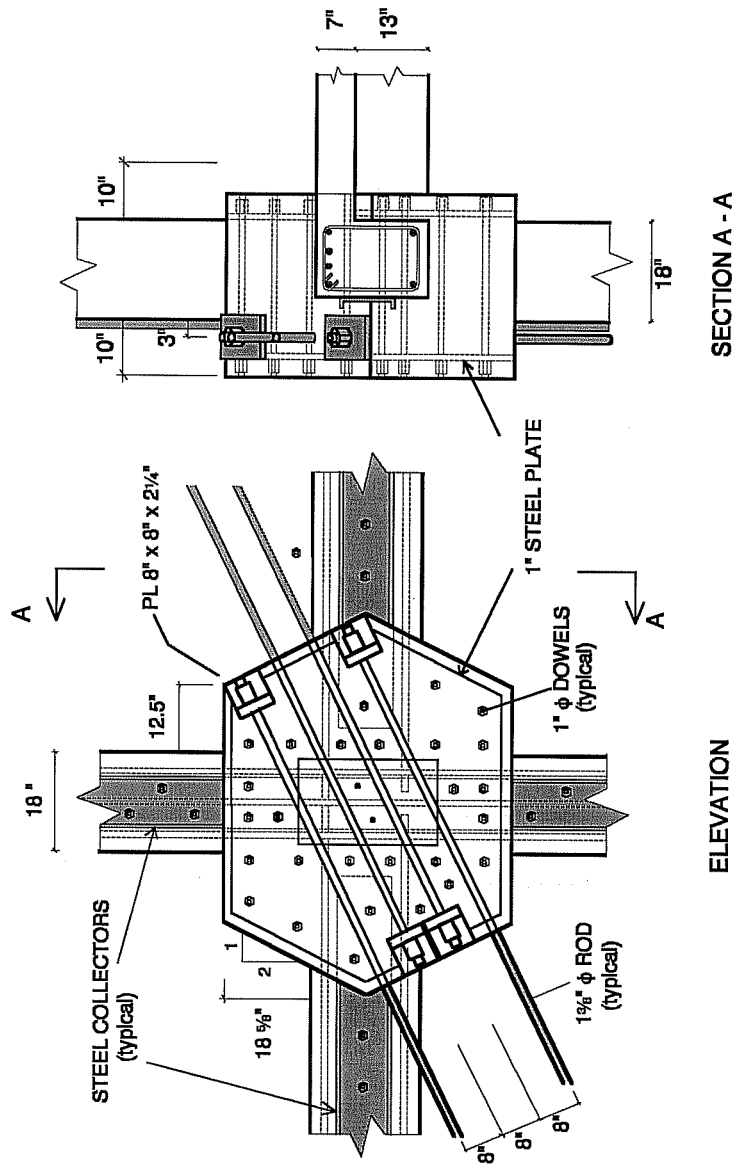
Elevation and cross section details of concrete anchor stub (double-end anchorage).
